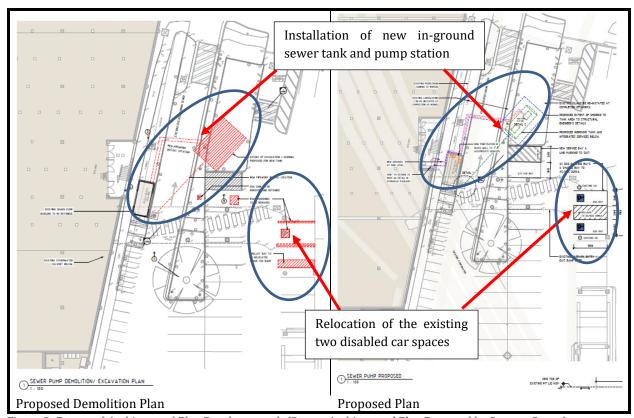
Proposed Architectural Plan Purple car park (Source Architectural Plan Prepared by Scentre Group)
